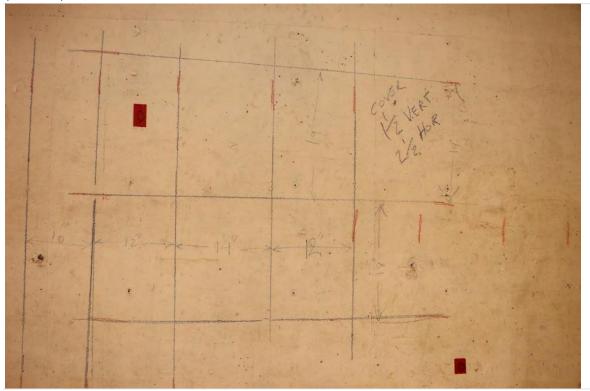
Concrete coring, West Wall, 1962 Construction - Basement (BA2-33)
